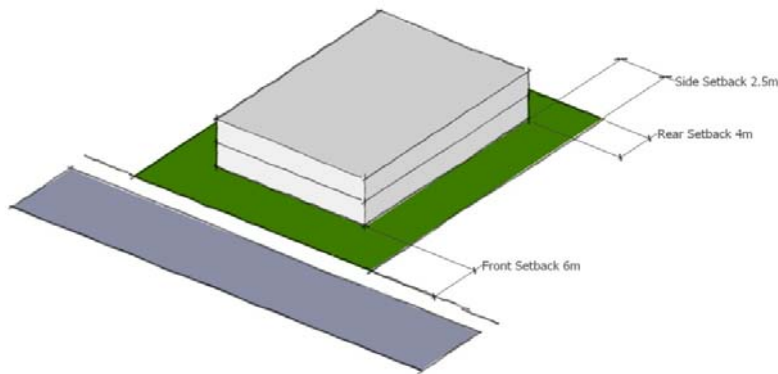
b – Setbacks – 1 or 2 storey Multiple dwellings
